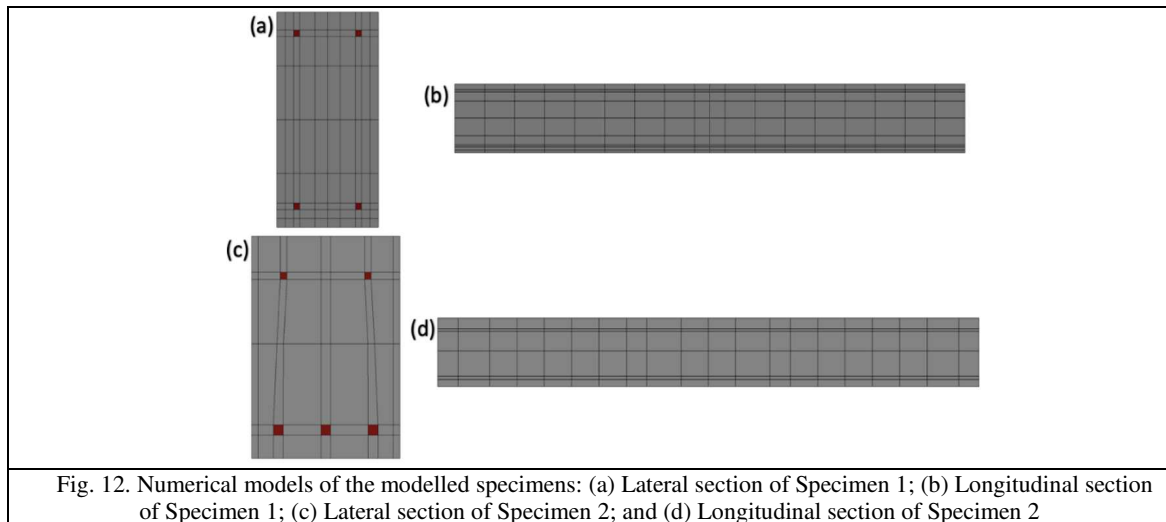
Numerical models of the modelled specimens: (a) Lateral section of Specimen 1; (b) Longitudinal section of Specimen 1; (c) Lateral section of Specimen 2; and (d) Longitudinal section of Specimen 2
